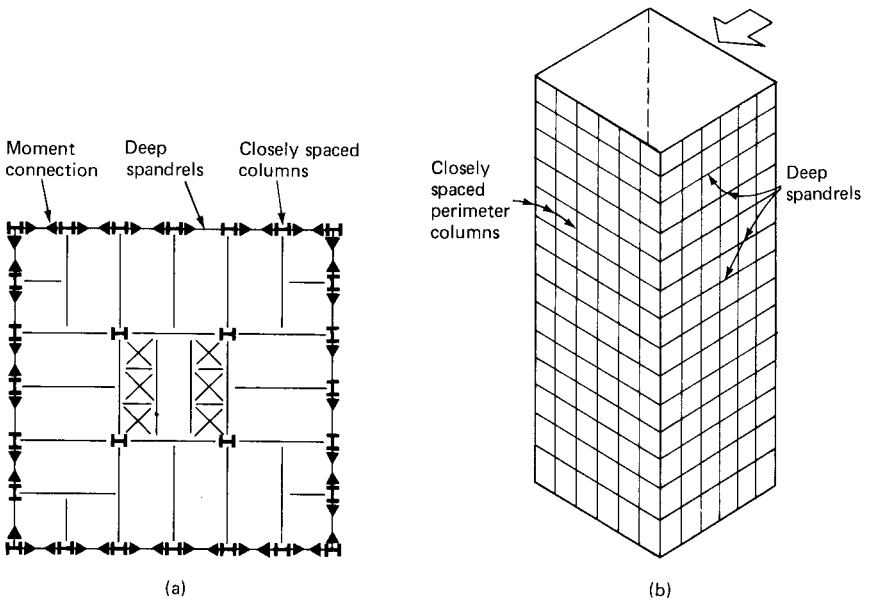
Framed tube building. (a) Schematic plan; (b) isometric view.
